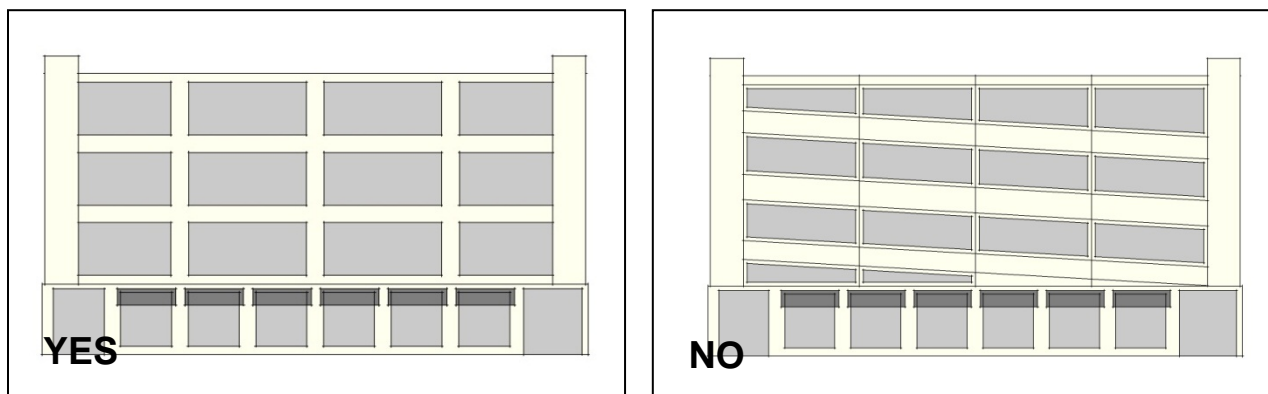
E: Parking Garage Design. A sloping approach may be used, but a horizontal plane should face public streets.
